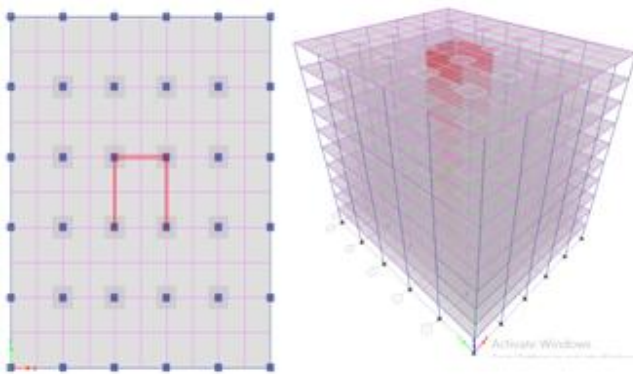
Plan and 3-D View of proposed building of flat slab with drop
